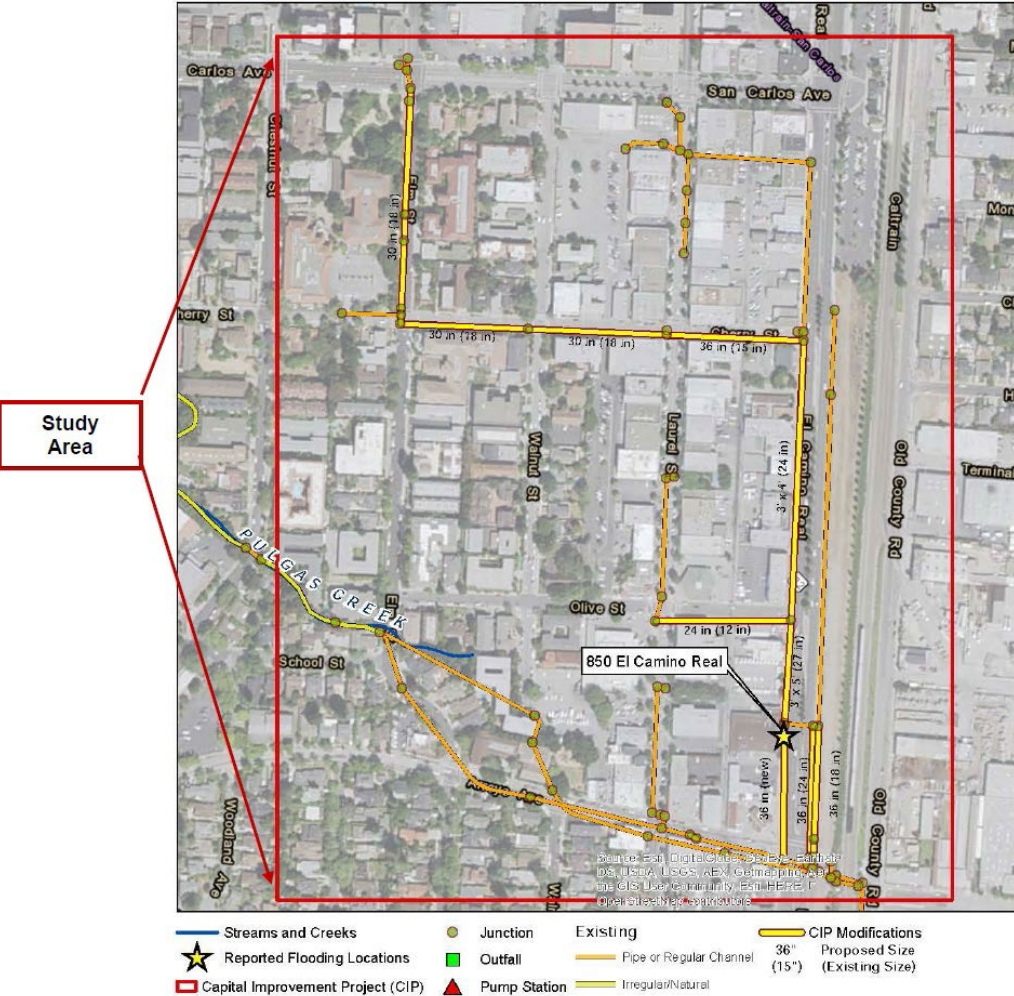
2017 STORM DRAIN MASTER PLAN PIPELINE UPGRADES WITH STUDY AREA
